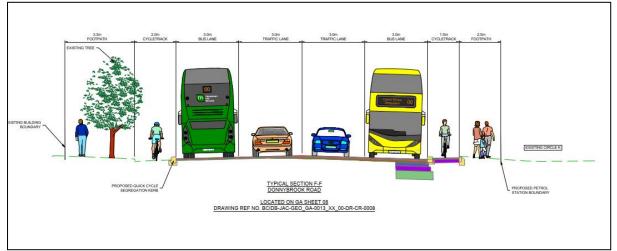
Extract from Typical Cross-Section Drawing (Sheet 04)
